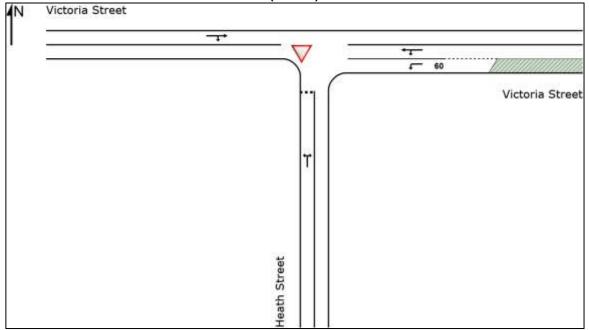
Priority Intersection Layout of Victoria Street with Heath Street(SIDRA)
